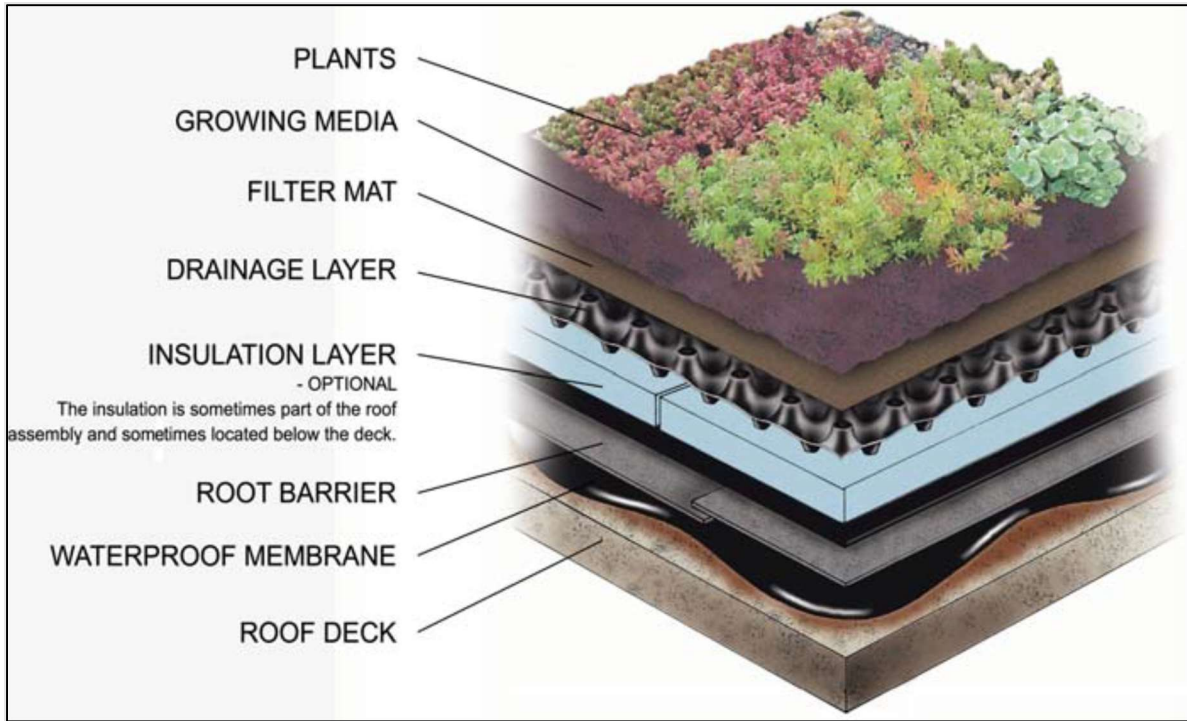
Layers of a Green Roof (Tolderlund, 2010)
